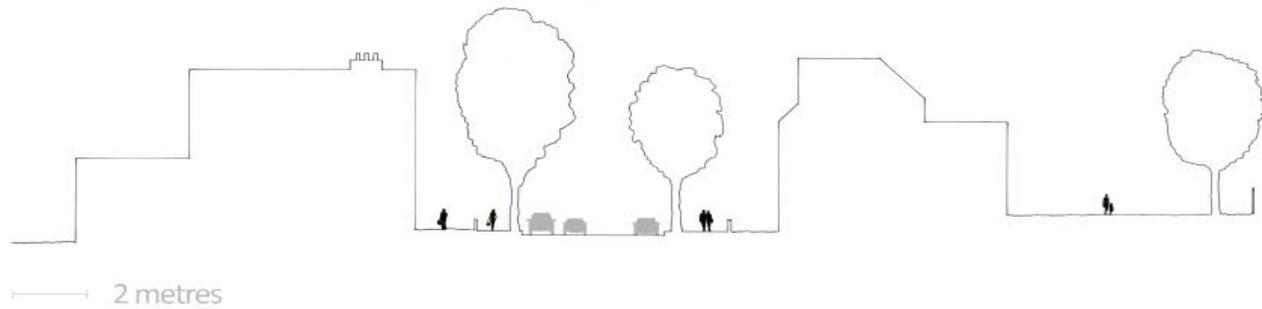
(above left and left): Sections through Hove Park Villas and Newtown Road/Hove Business Park and railway station. Source: site visit
